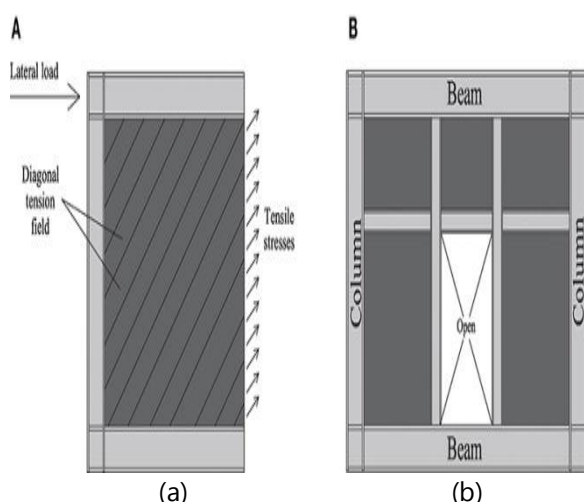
(A) Diagonal tension field of a typical SPSW, (B) Fully-stiffened SPSW with door opening.
